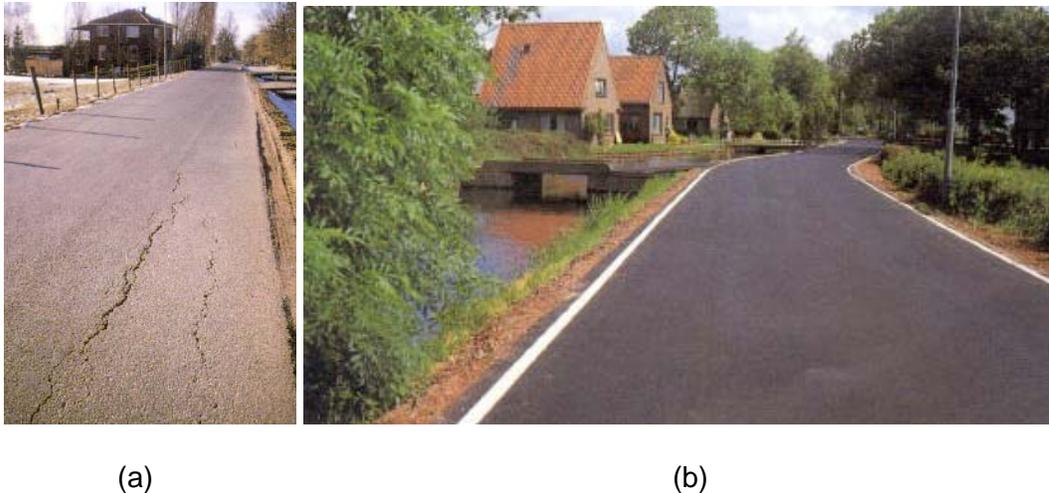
Conditions of the Roadway in 1985: (a) Control Section; (b) Reinforced Section with PaveTrac (Courtesy: ACF Environmental)
